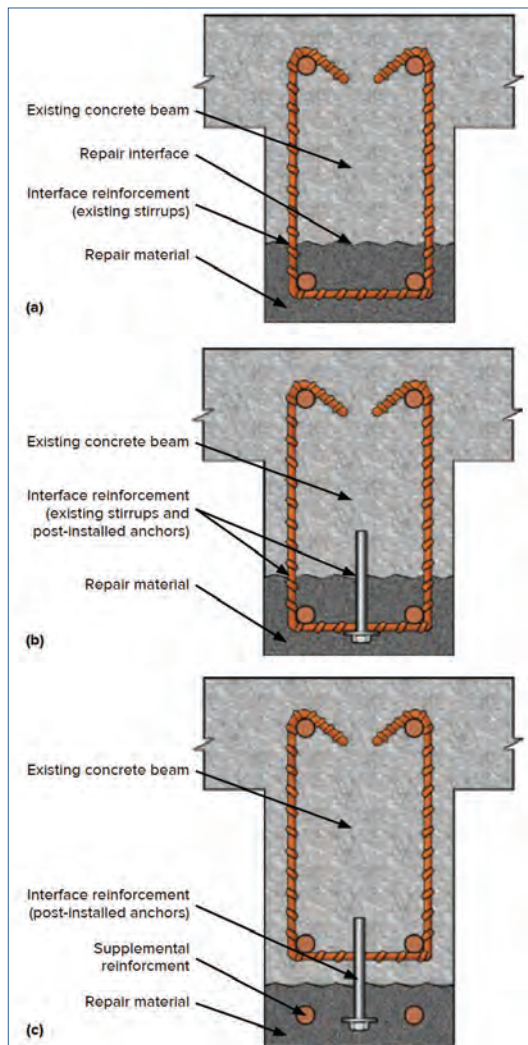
Typical beam soffit repairs: (a) beam with sufficient stirrups; (b) beam with insufficient or corroded stirrups; and (c) beam with section enlargement
